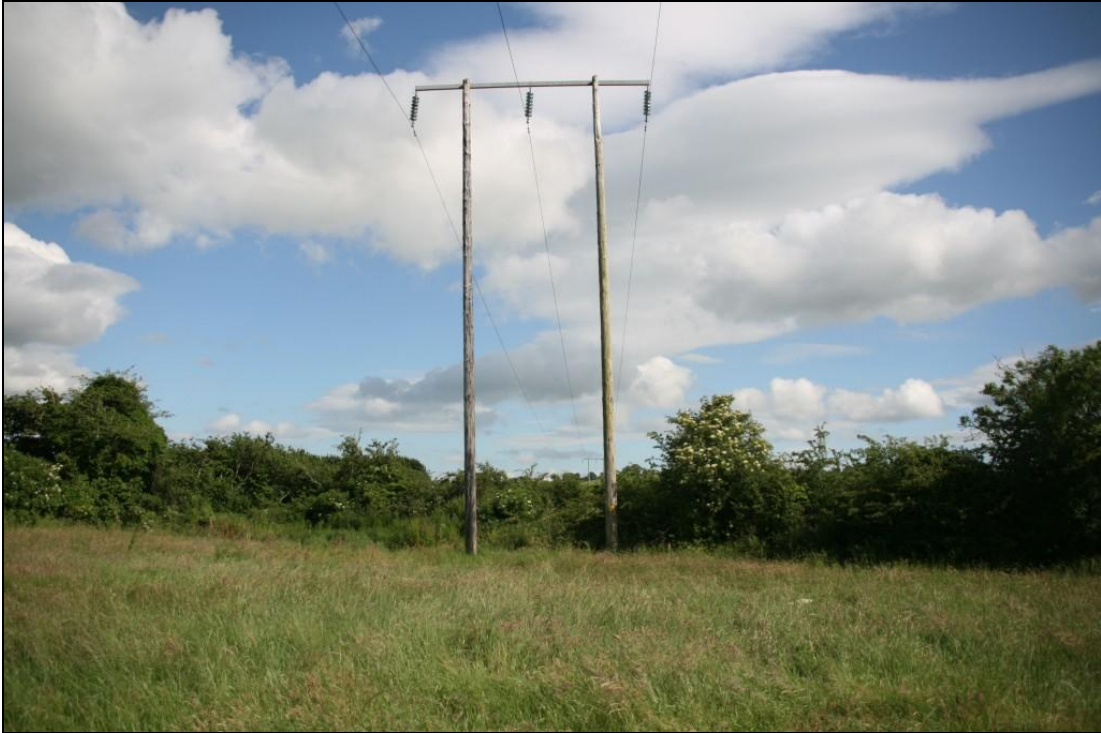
View of existing Ballyragget to Kilkenny line adjacent to River Barrow and Nore SAC at Gragara (Structure BK48). Hawthorn scrub occurs on a south facing slope within the SAC (background).
